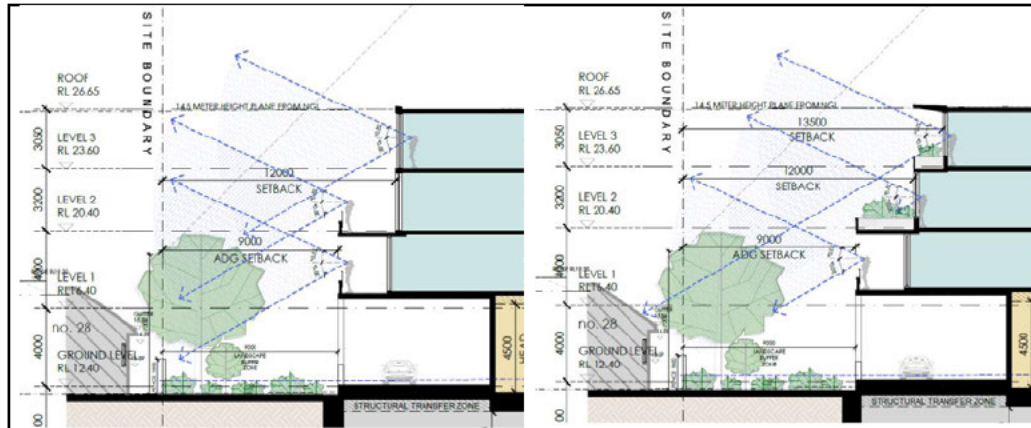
Proposed building setbacks, previous (left) and revised having considered the advice of the Woollahra LPP (right) (Source: Ethos Urban)
